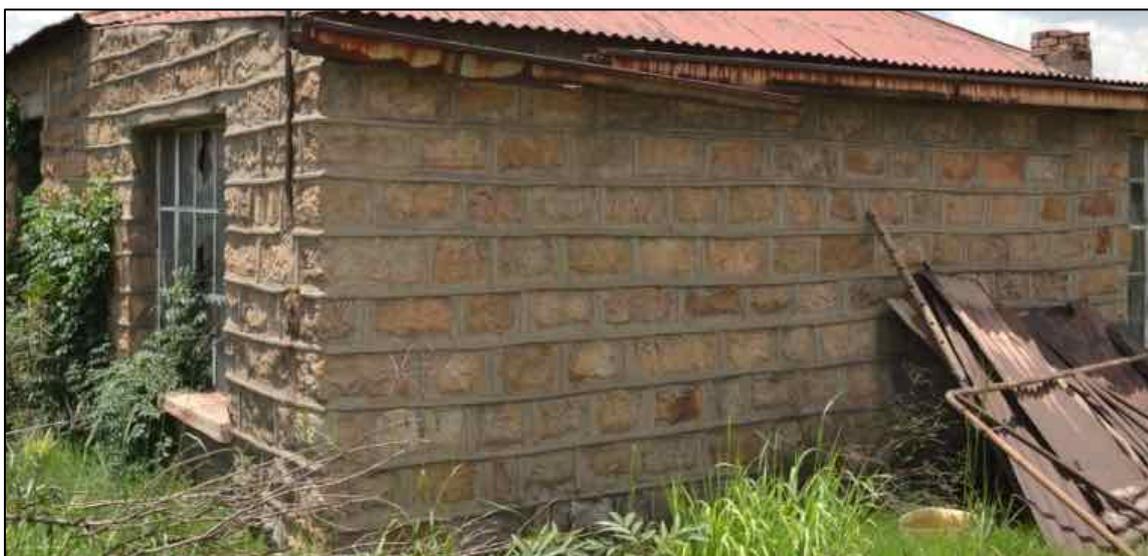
One way to distinguish between the sandstone masonry of the core dwelling and that of the more recent additions is the prominent pointing of the more recent walls.
